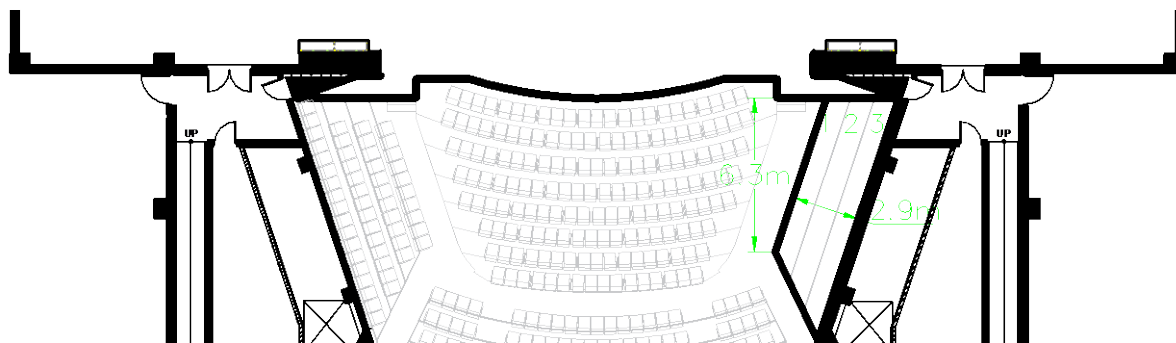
Chinese Orchestra Pit (Side Auditorium Platform) location plan
